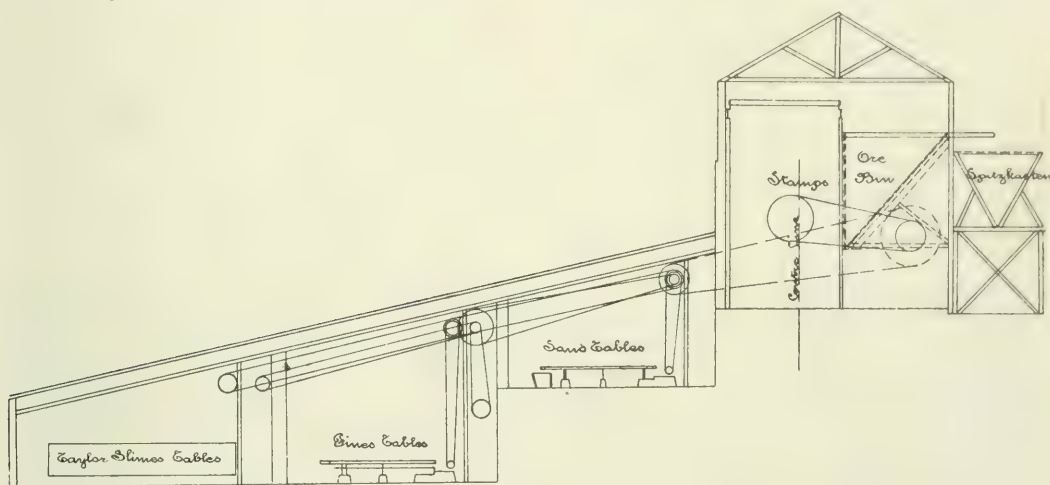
VERTICAL SECTION ACROSS DRESSING HOUSE.
